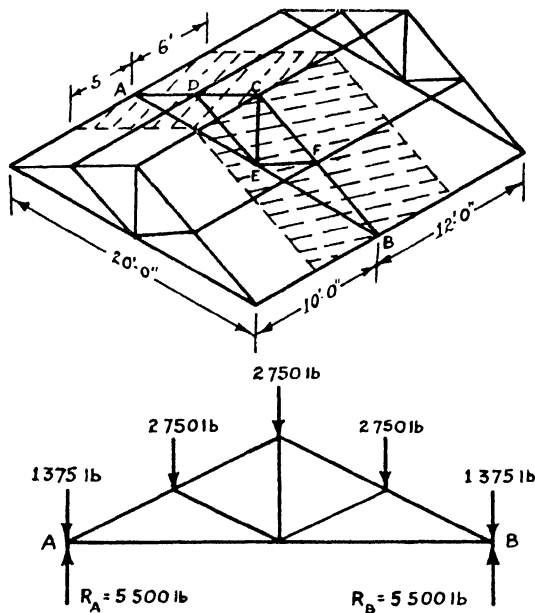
LOAD CARRIED BY ROOF TRUSS
